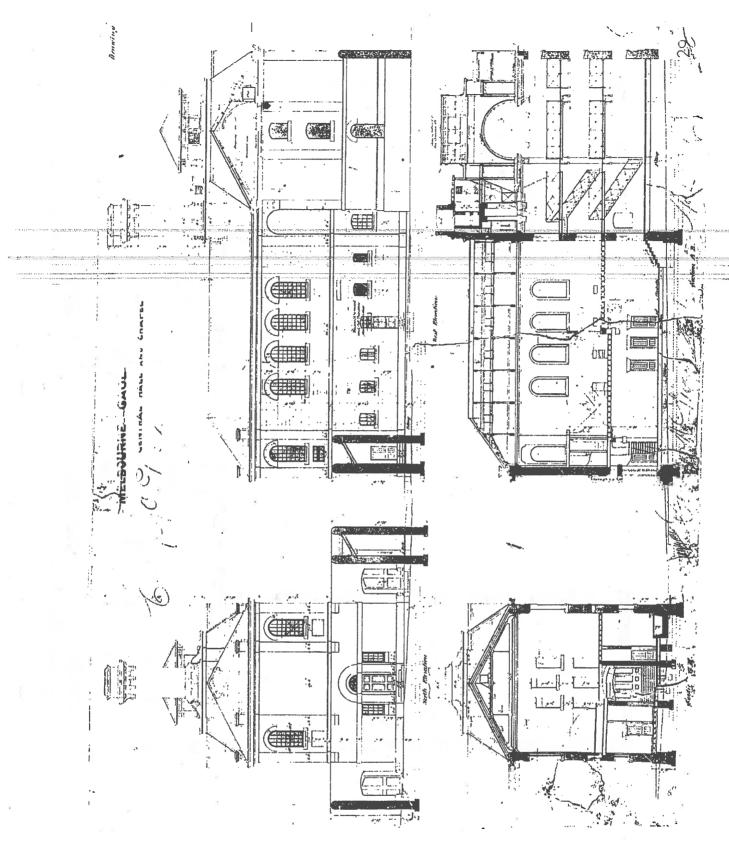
"Melbourne Gaol Central Hall and Chapel" Elevations and Sections, 1860
